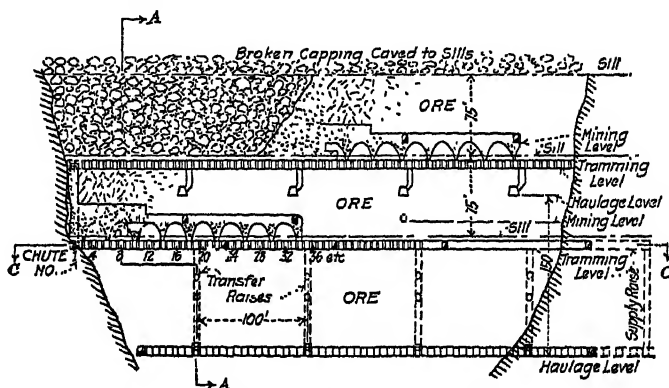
SECTION THROUGH B-B OF FIG. 1.
